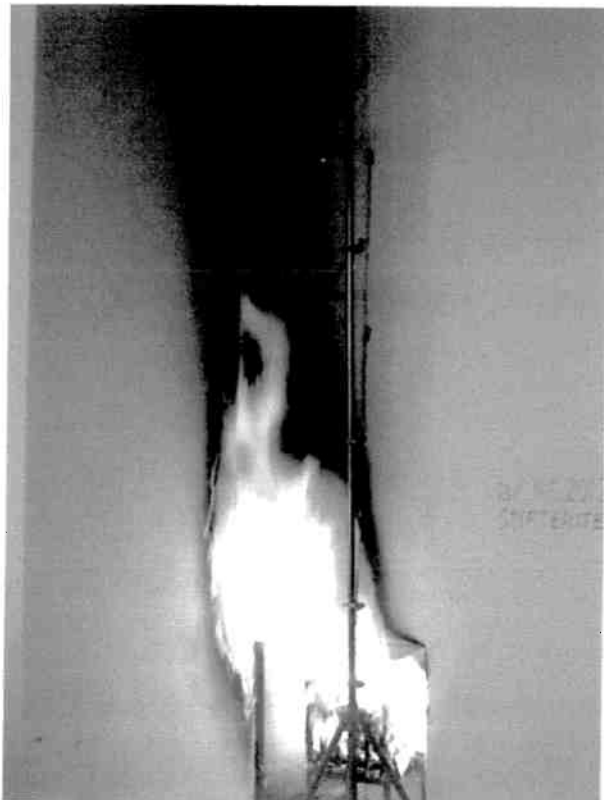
(P1060113): Test specimen during testing (5 minutes into test)
